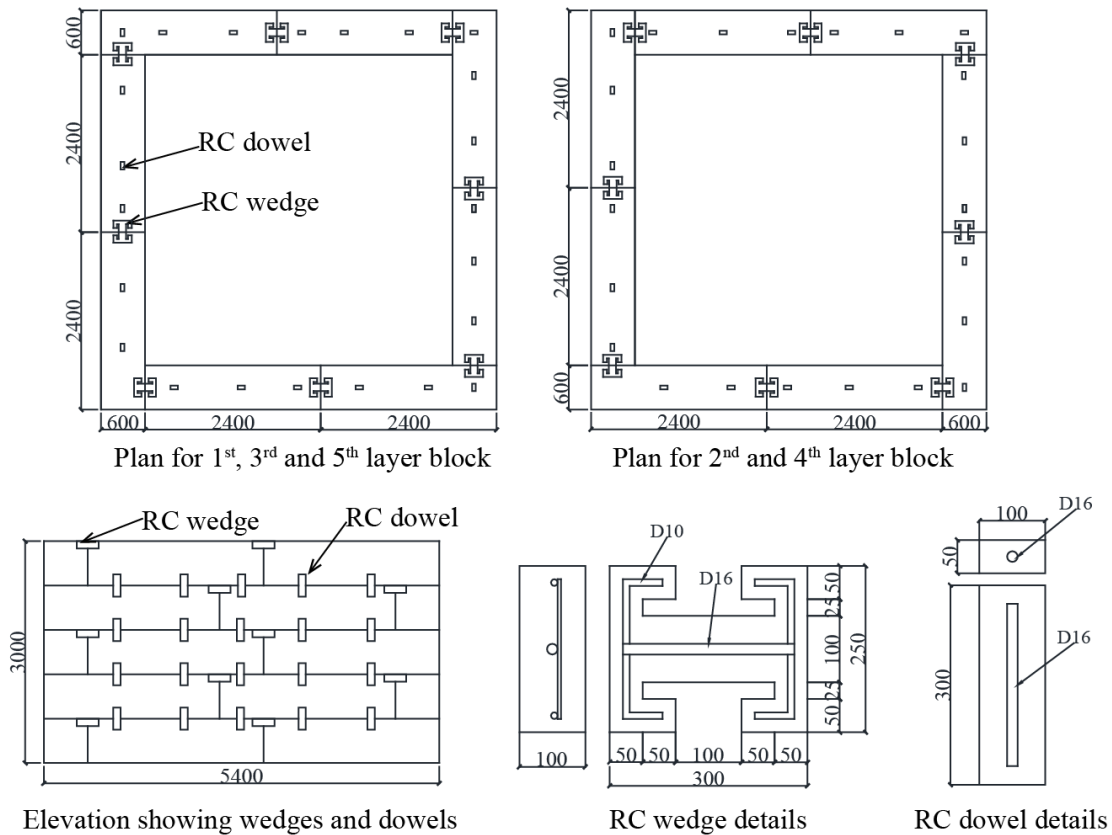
Details of reinforced rammed earth specimen of New-RE-A.
